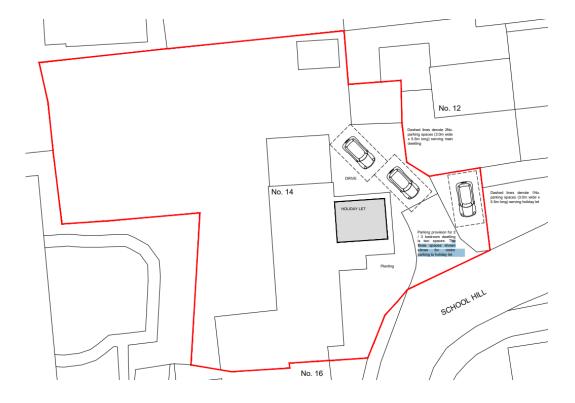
Extract from accompanying block plan detailing the extent of the proposed parking <u>arrangements</u>
